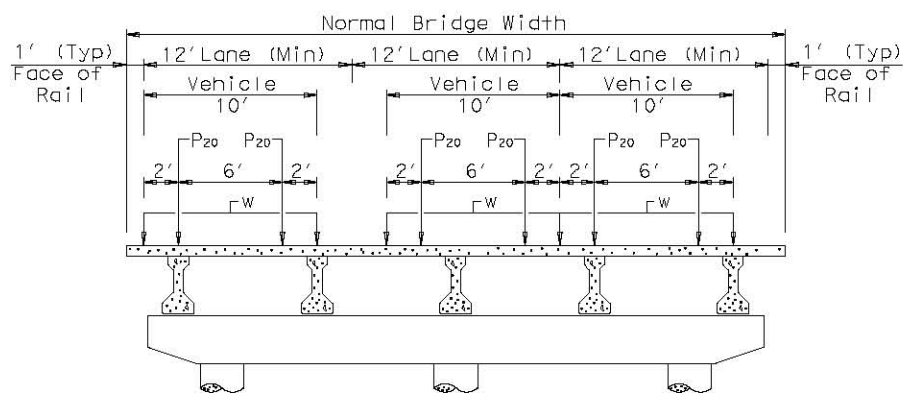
Applying Live Load on the Structure for Slab, Beam, and Bent Design (see following explanatory notes) (Online users can click here to view this illustration in PDF.)
